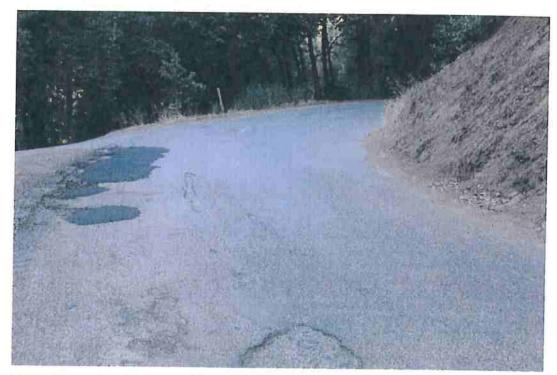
Mile 1.9: 18-ft road width with 2-ft shoulders.
